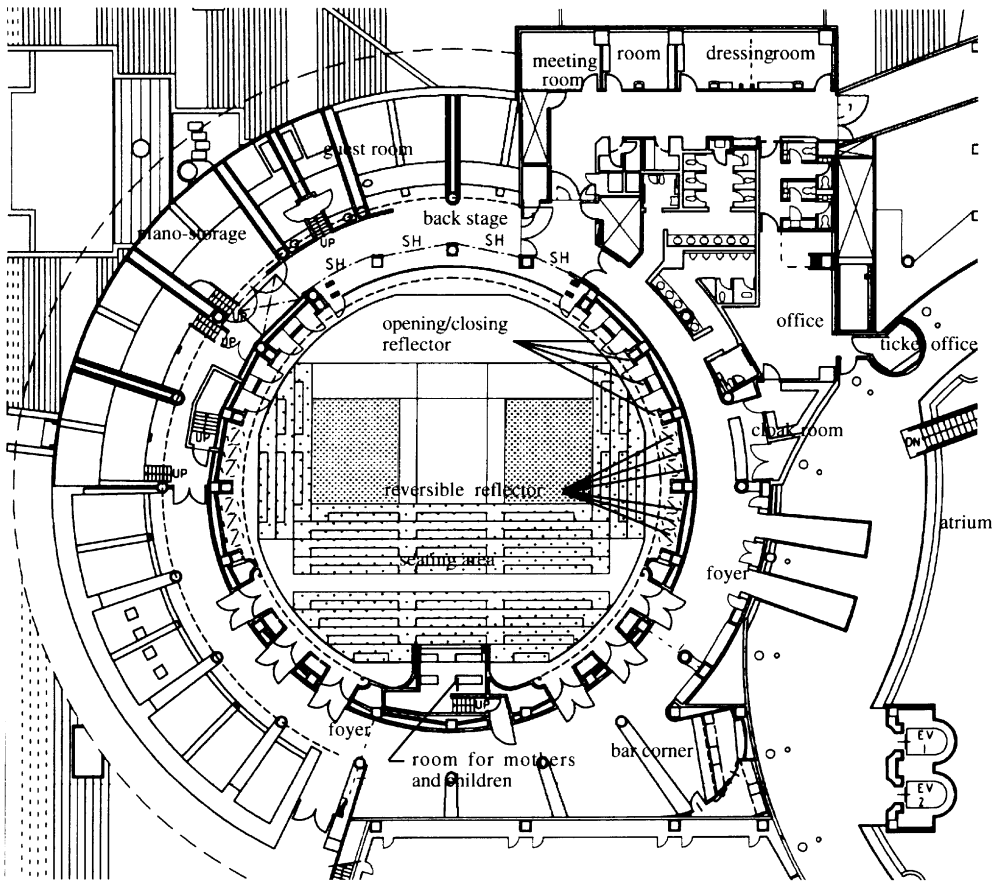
Plan of Orbis Hall with various acoustic equipments.
